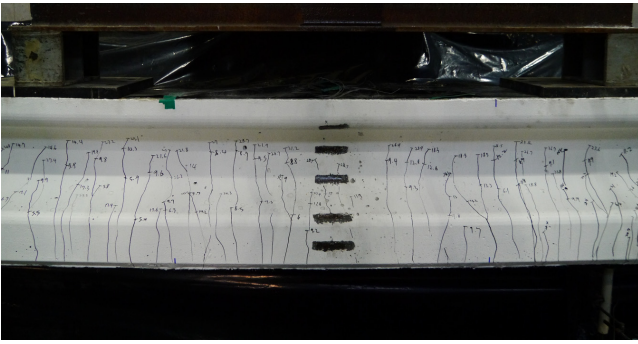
Typical Crack Patterns of F0.7RT2 Beam
